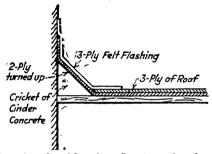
Flashing of roofing felt only. Juncture of roof and vertical surface.
